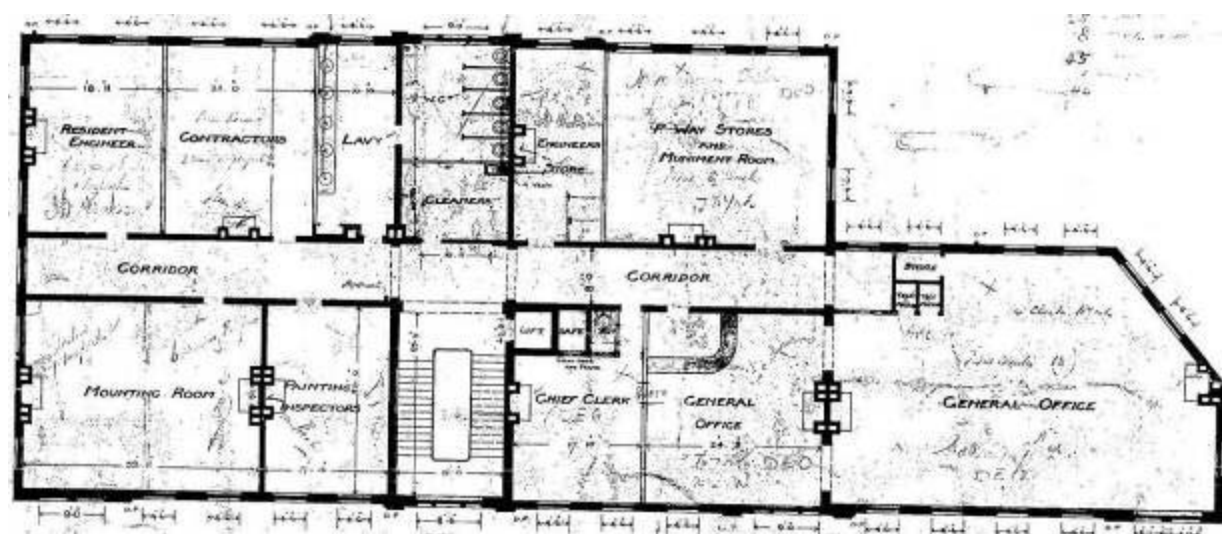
1904 second floor plan of Kings House (N is to the right)
